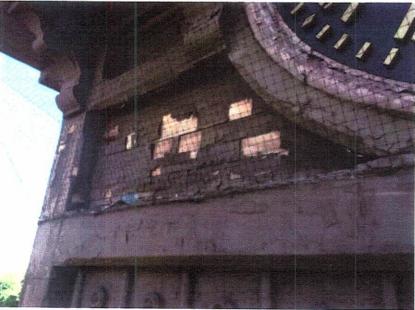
West elevation, clock tower. Thick paint loss exposing bare wood substrate.
